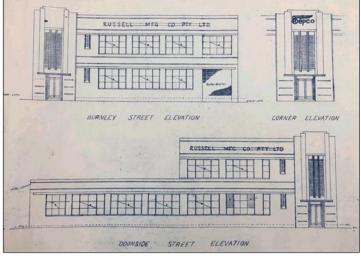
Undated (c1942) architectural drawings for the Repco building on the corner of Burnley and Doonside Streets. Source: Public Record Office Victoria.
